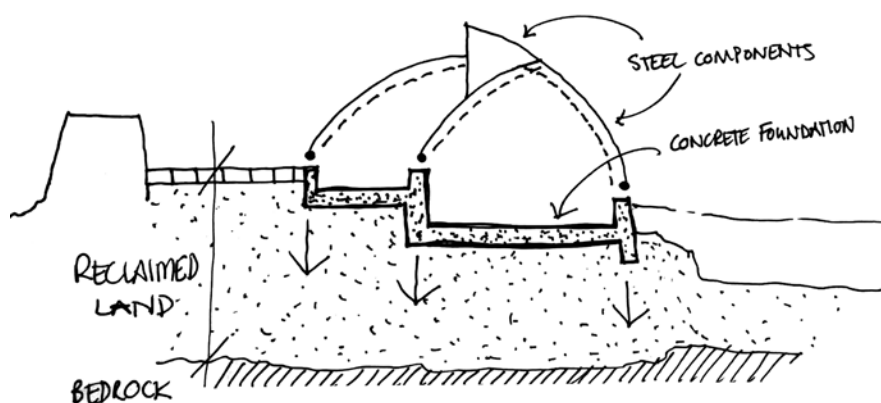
Early sketch of the basic idea behind the foundation of the museum. The foundations and floor slabs are mimicking the surfaces around the old wall, and the large 4m x 2m x 1.5m concrete blocks are also used throughout the lower levels as the same language of the exterior terrain is drawn in through the building.
